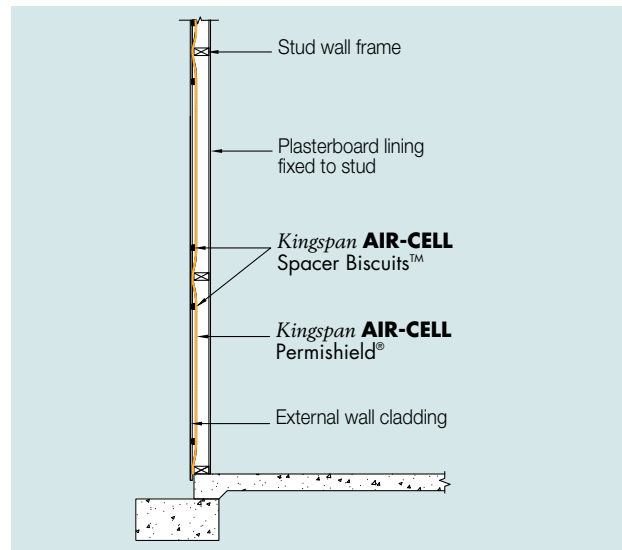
Side elevation of Kingspan AIR-CELL Permishield® on steel-framed wall
